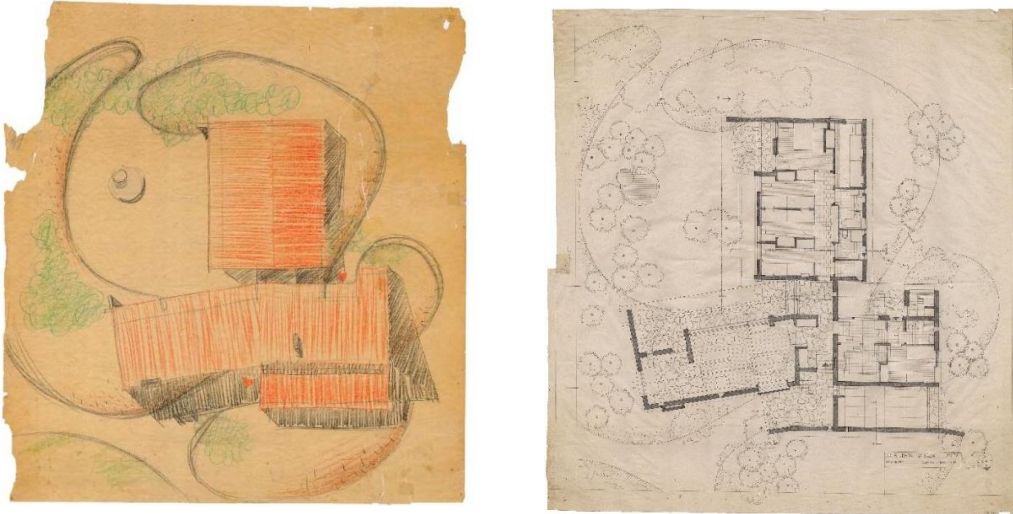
Dr Ribeiro da Silva House, Fernando Távora – drawings (roof plan and ground floor plan) showing the importance attached to the existing natural features. Source: Távora100 (2023)
